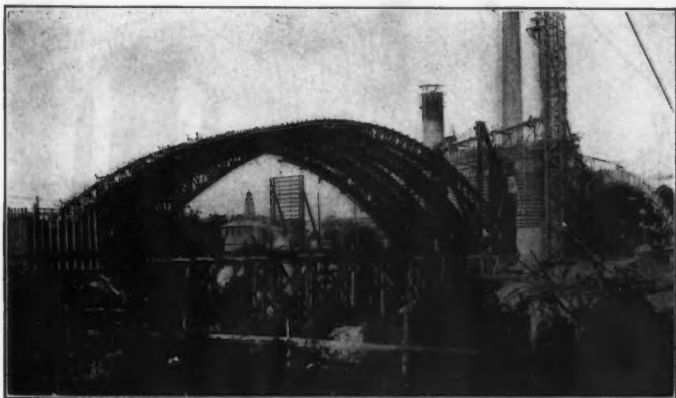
MAIN STREET VIADUCT, SPAN B: STEEL ARCHES ERECTED.
